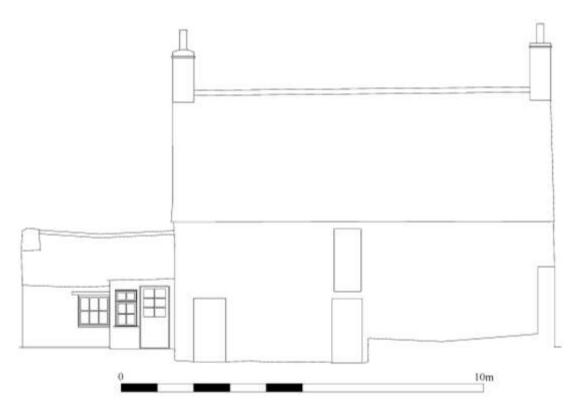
North-facing elevation (without lean-to extension) Modified from client's plans
